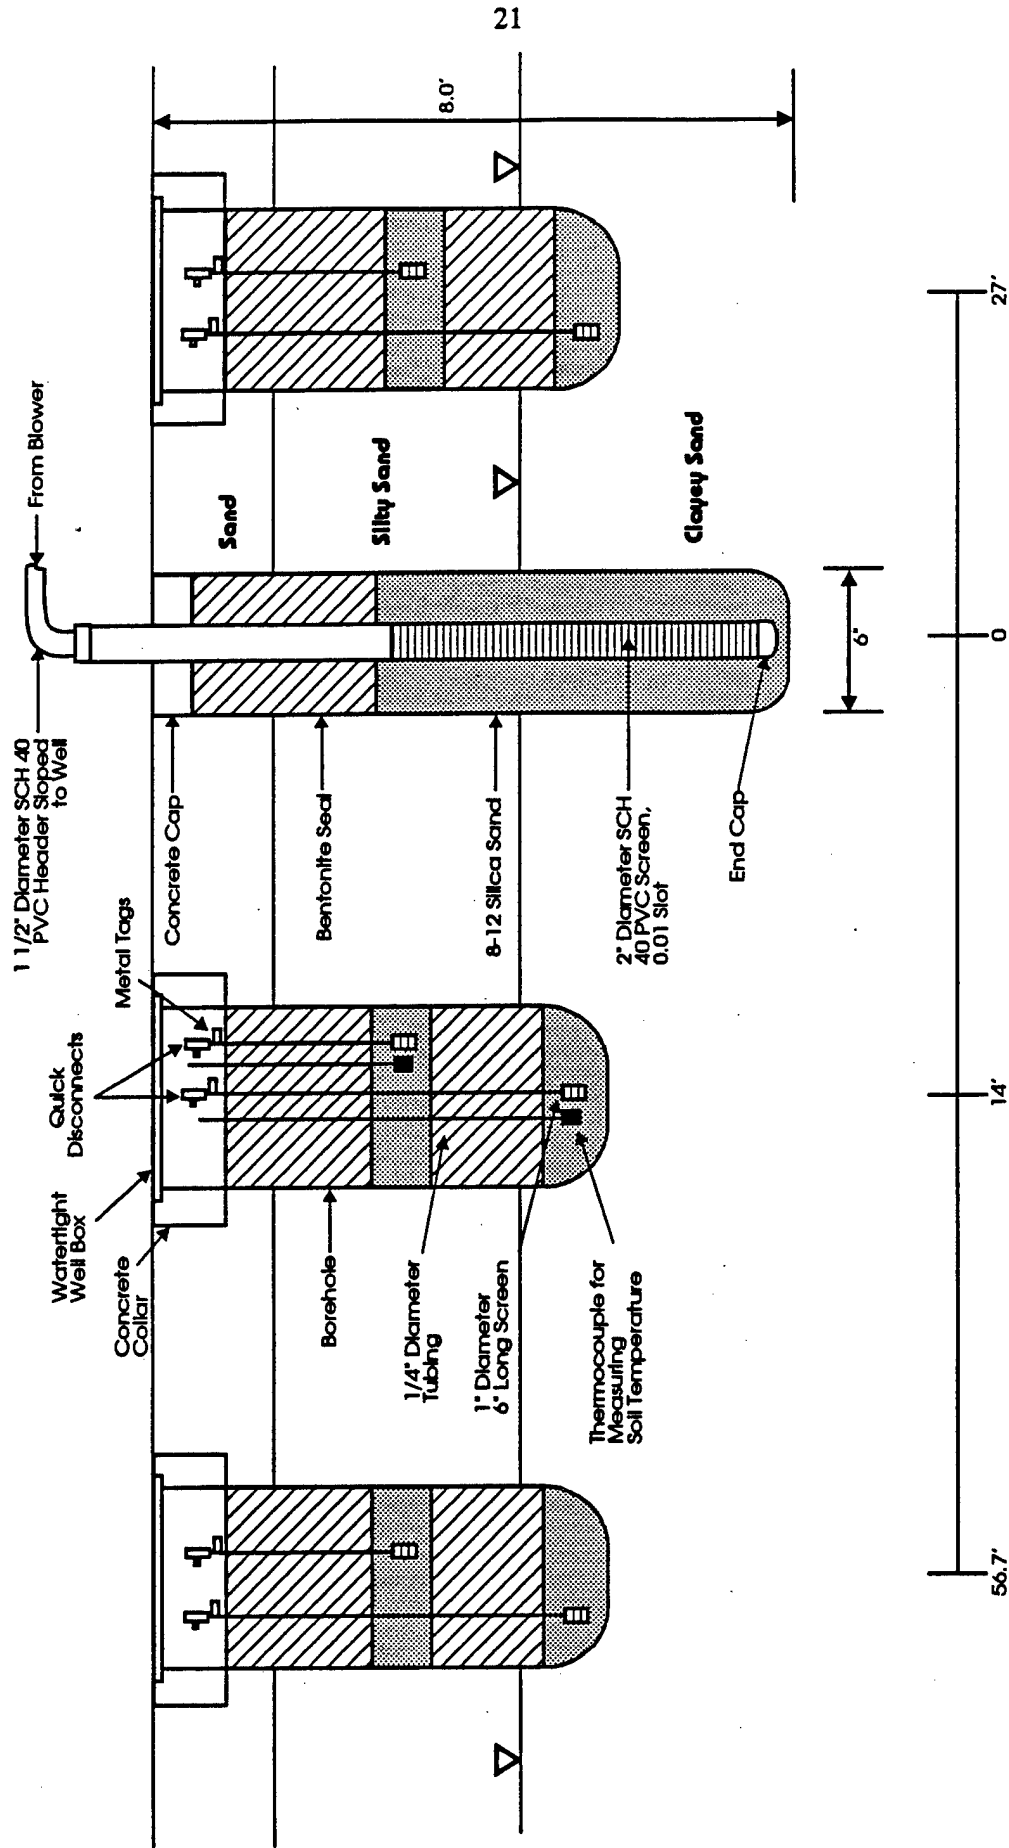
Cross Section of the Vent Well and Monitoring Points at SWMU 66 Showing Site Lithology and Construction Detail (not to scale)
